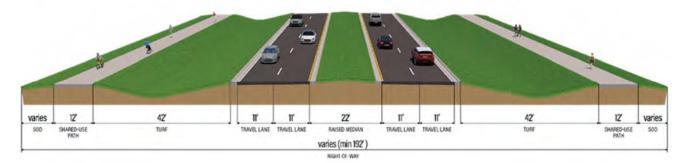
Suburban Typical Section (Segments 1, 4, and 6)
